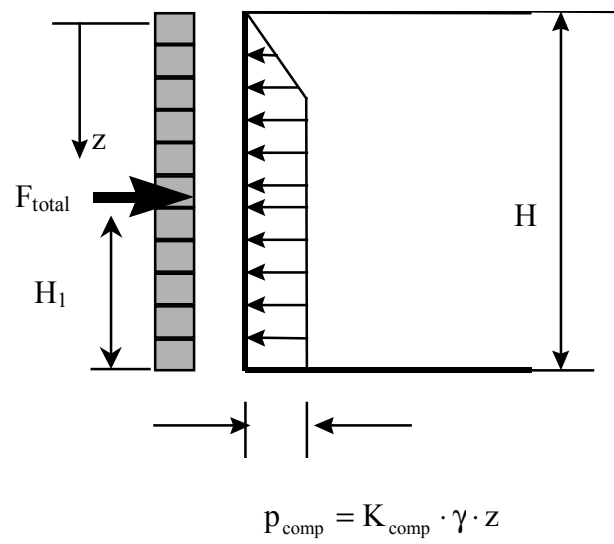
Lateral composite pressure distribution of a reinforced retaining wall.
